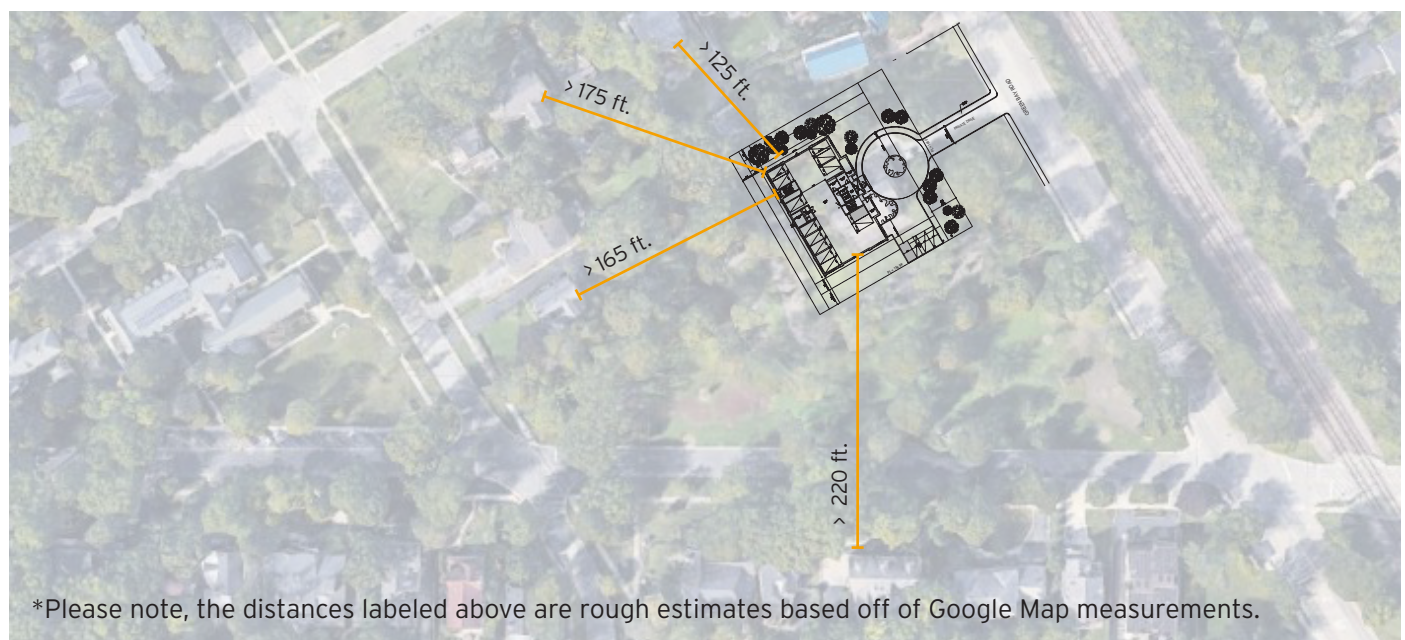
A - 5C: BUILDING BULK CONTEXT ALONG GREEN BAY ROAD CORRIDOR
